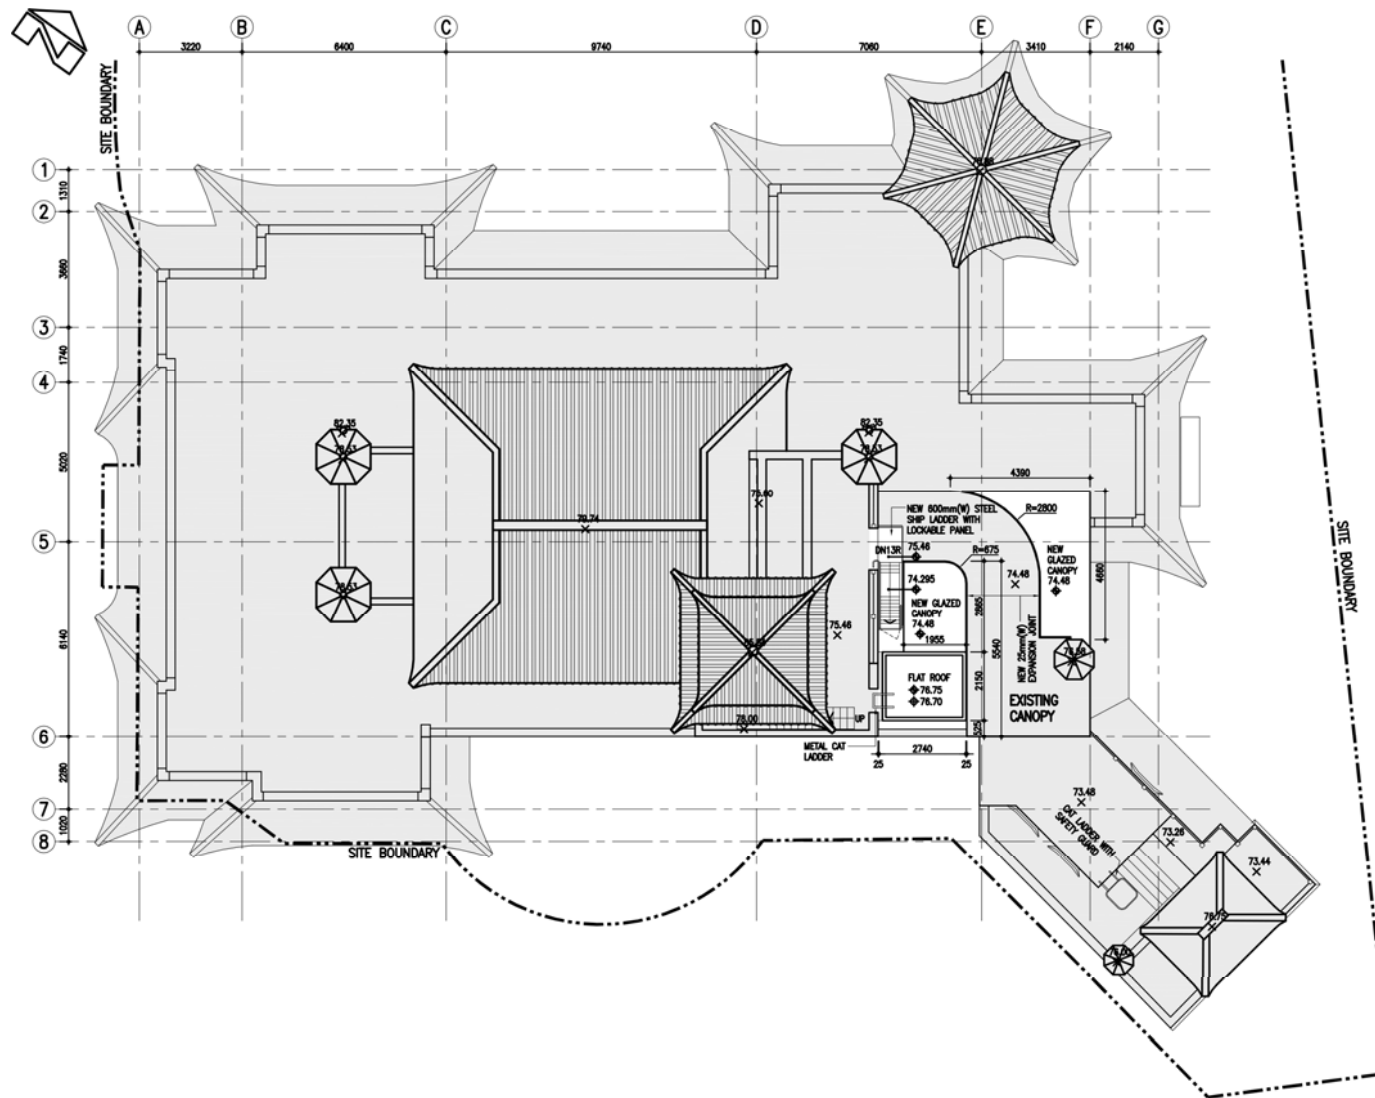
Proposed Upper Roof Plan of the Mansion (not to scale)
